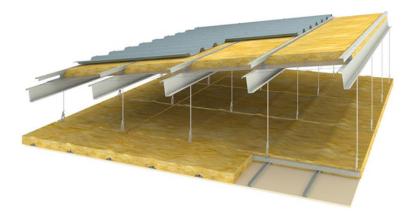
Illustrative picture of Ashgrid System with plasterboard ceiling and ceiling insulation [17]
